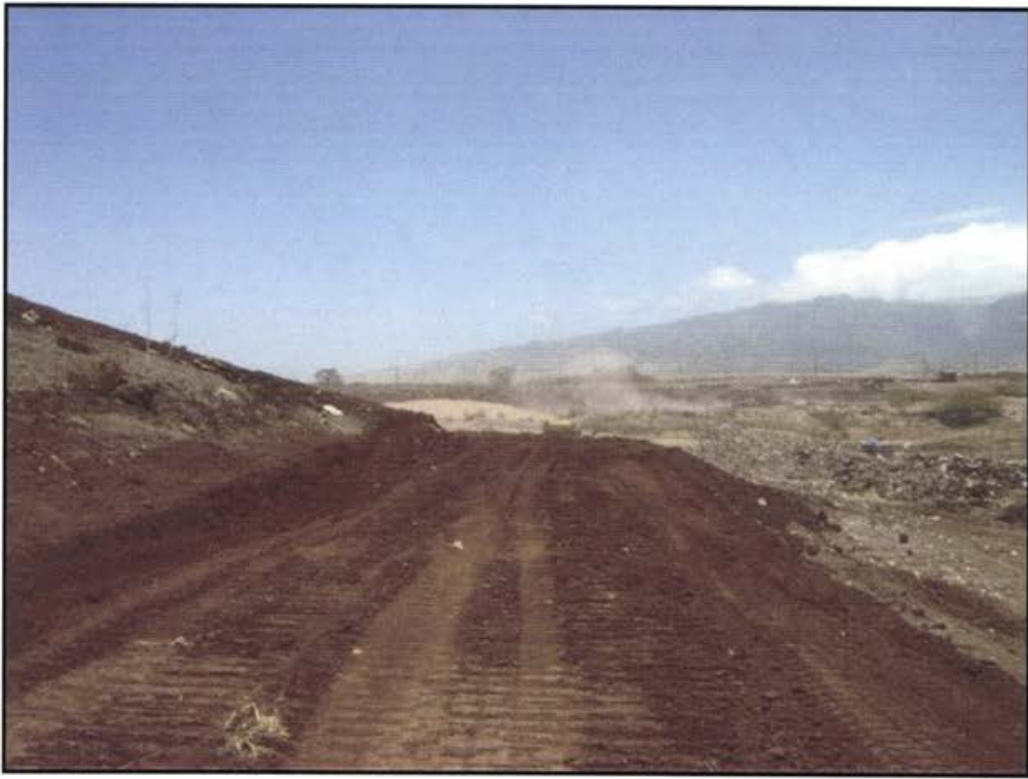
Graded and compacted MFC soils placed over perimeter road.
